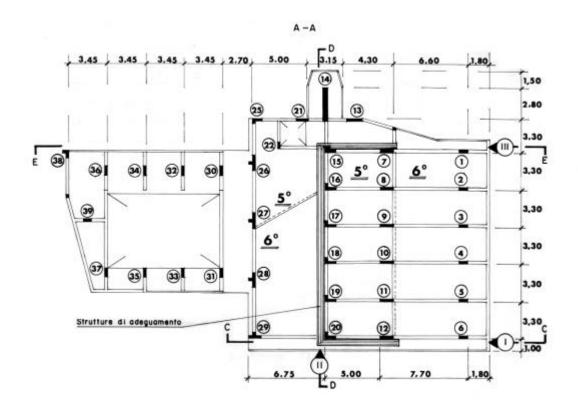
Section A – A (Plan of 5<sup>th</sup> and 6<sup>th</sup> floor Structures)
